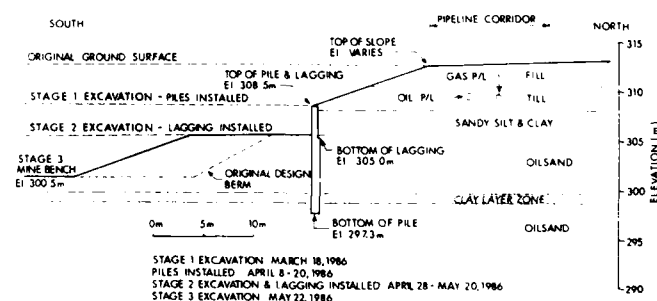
Typical Cross-Section Through the Retaining Wall and Overburden Slope
